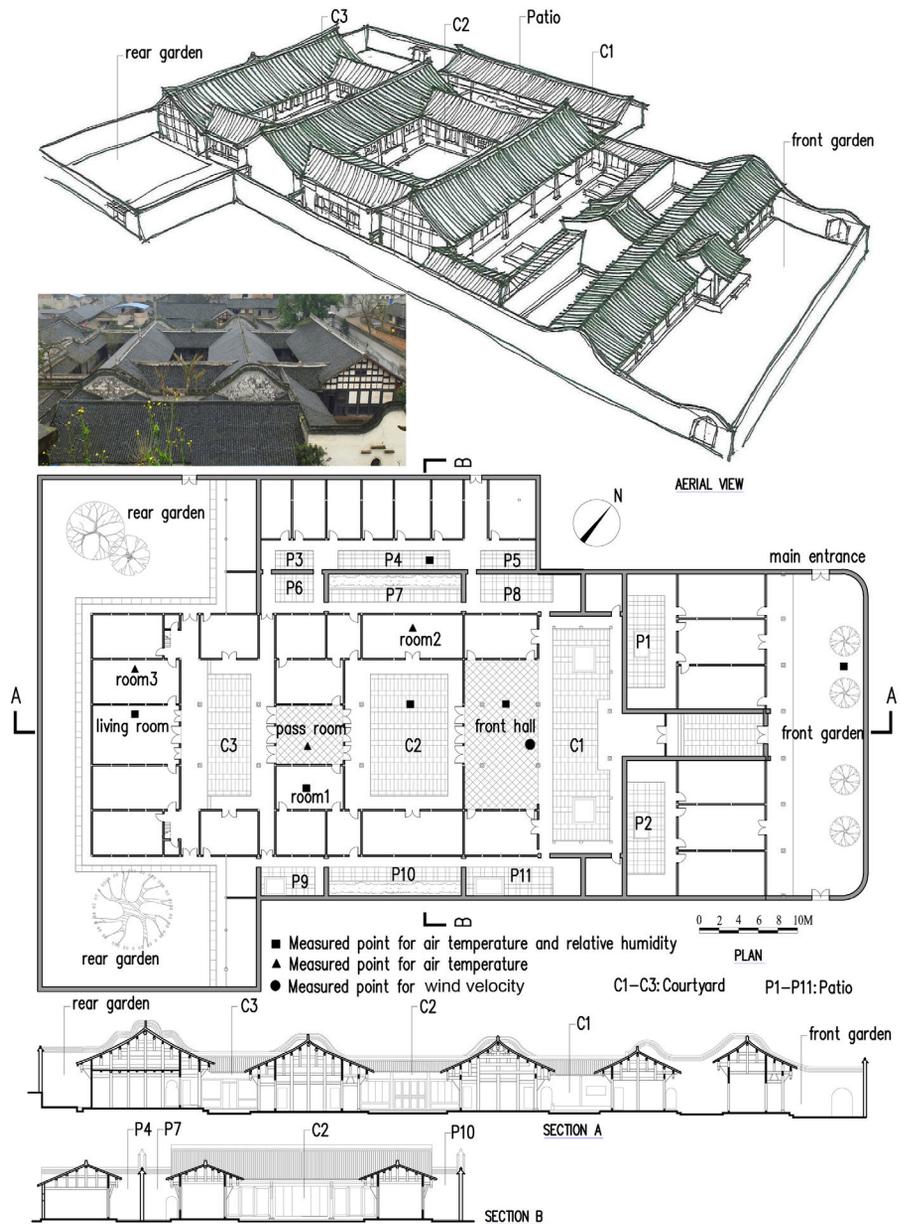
The aerial view, plan and sections of the vernacular house and the measured points
